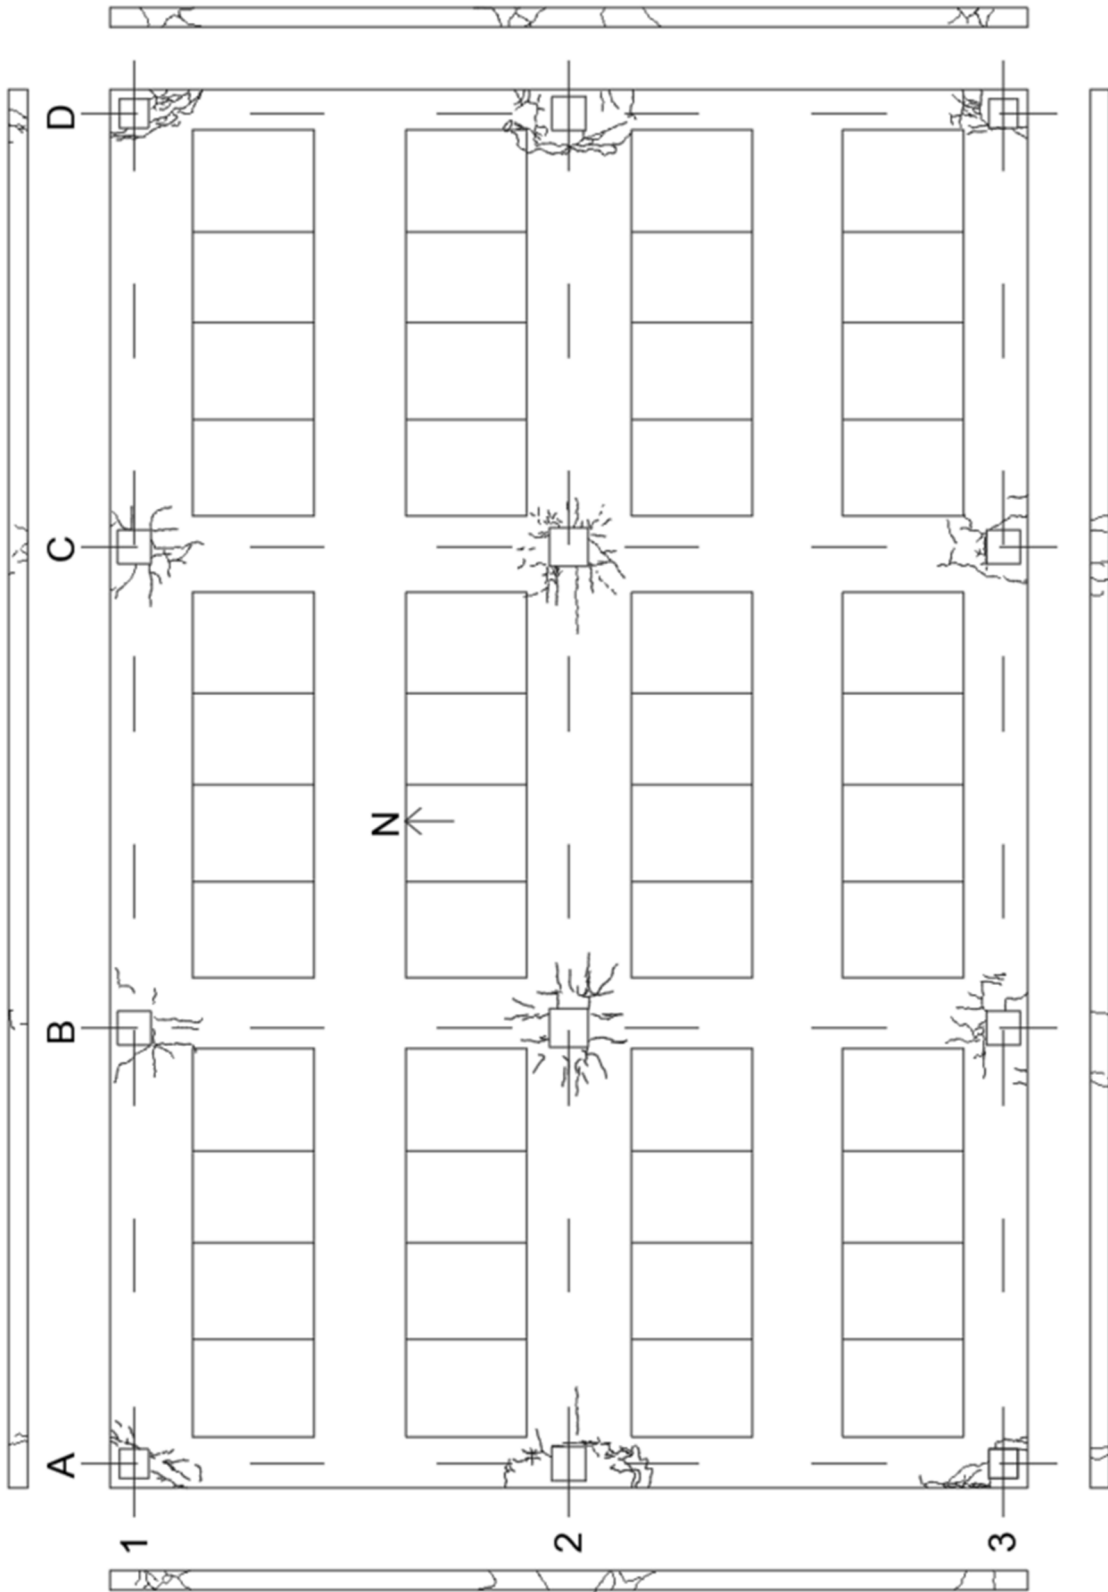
Crack pattern extrados 1st floor Test Cyc-1 (f02).
